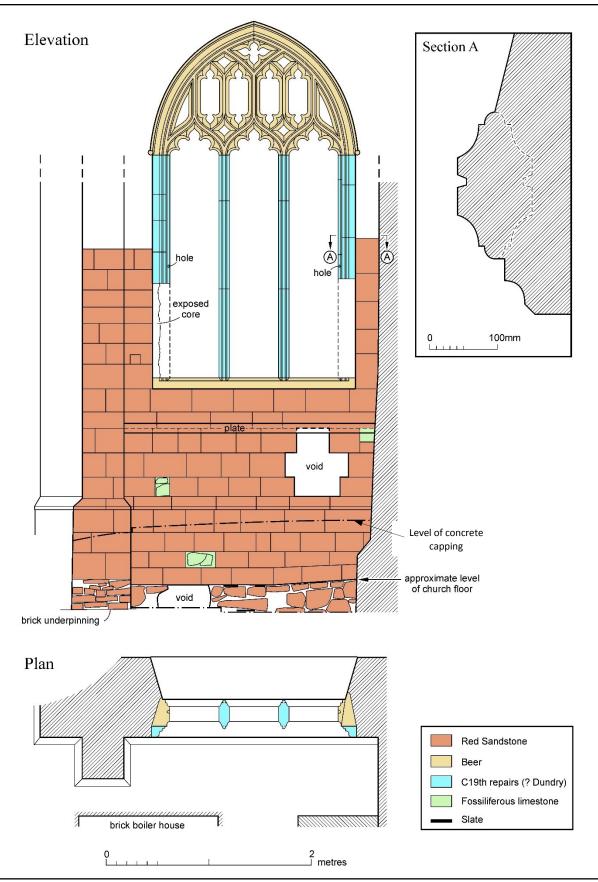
Elevation and plan of the west wall of the north aisle prior to demolition showing the geology of the masonry and a section of the mullions and jambs.
